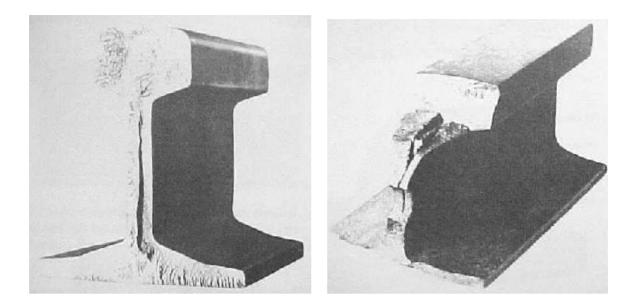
1322 OR 2322 - WEB, HORIZONTAL CRACK AT BOTTOM FILLET RADIUS
